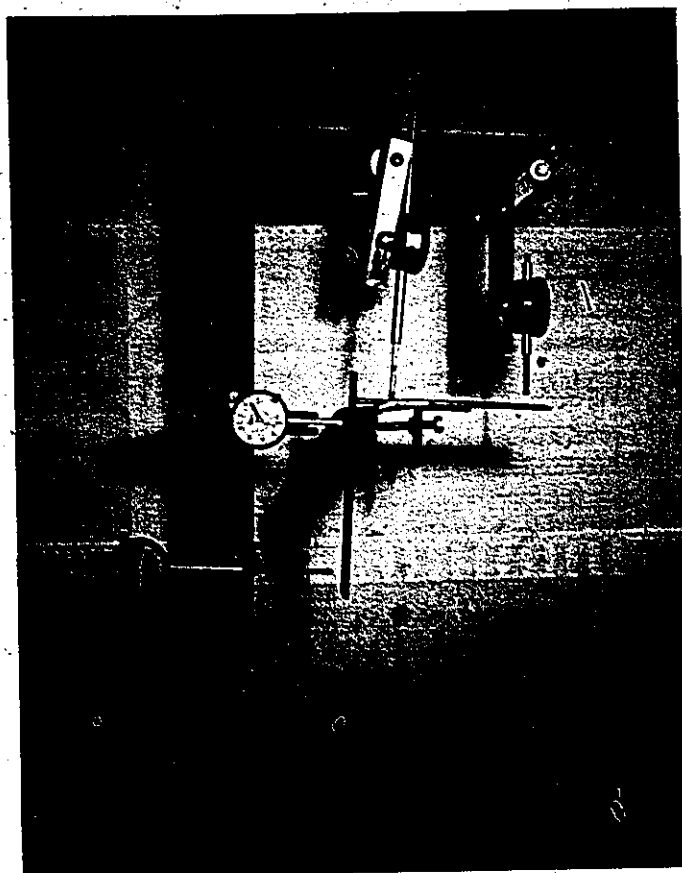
Arrangement of dial gauges at midspan of the test specimen.
